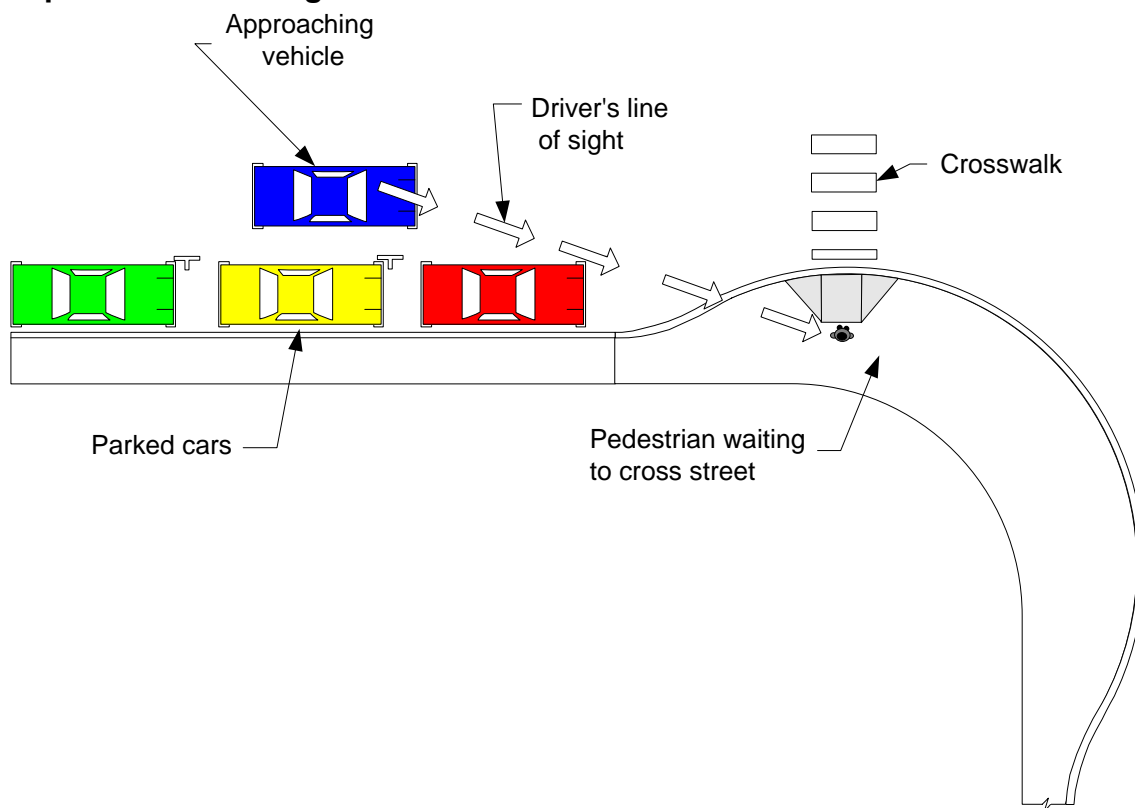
Improved Line of Sight at Intersection with Curb Extension
